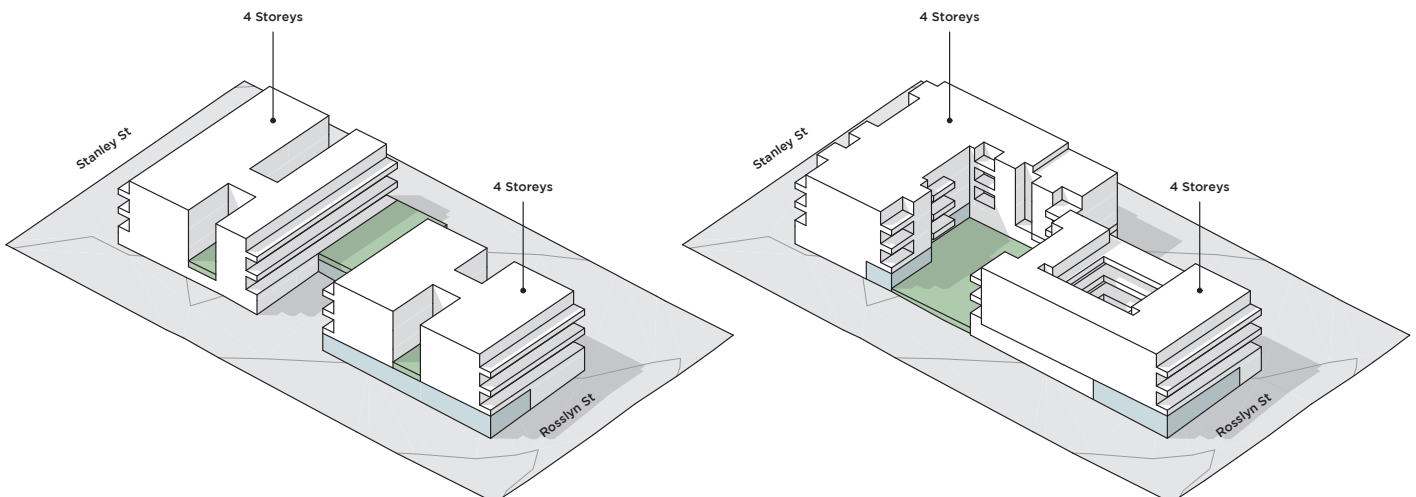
Built form testing to show the proposed floor area ratio and built form controls on a mid-block site in Adderley (DDO29-2). Images are indicative only to test the proposed controls and are not representative of actual building proposals (West Melbourne Built Form Testing, Breathe Architecture).
